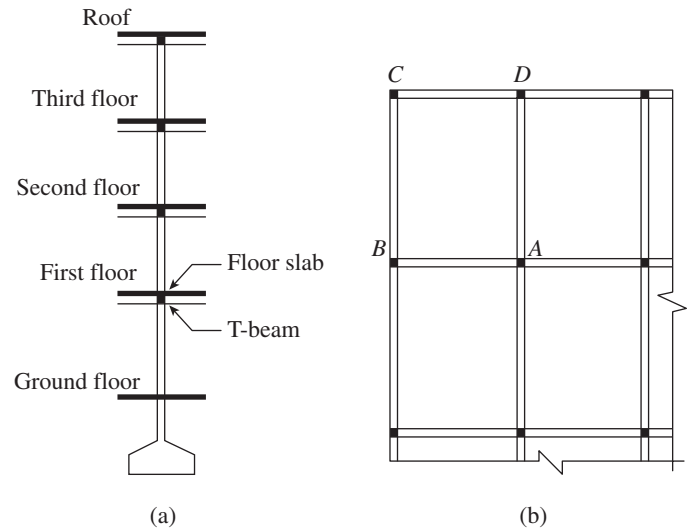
Columns in typical multi-storey buildings (a) Section through column (b) Part floor plan
